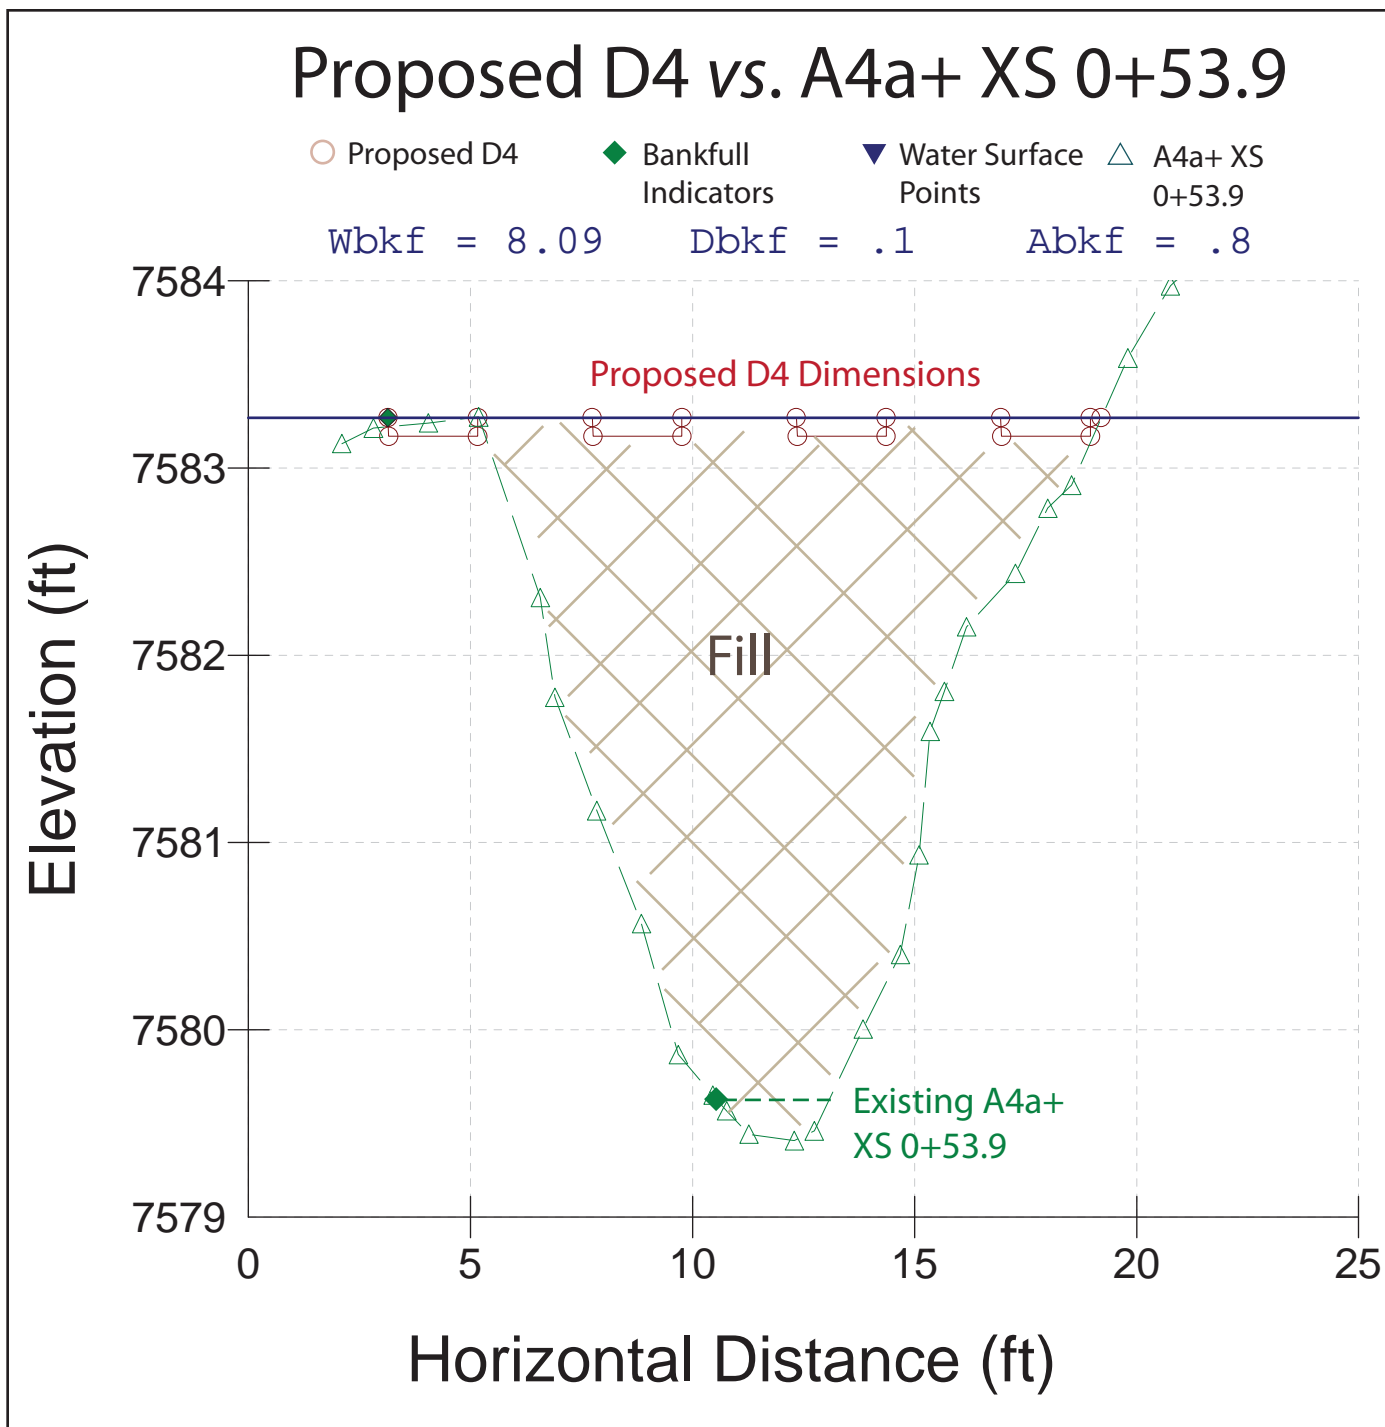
The proposed D4 cross-section vs. the existing A4a+ cross-section 0+53.9 indicating the extensive fill requirements.
